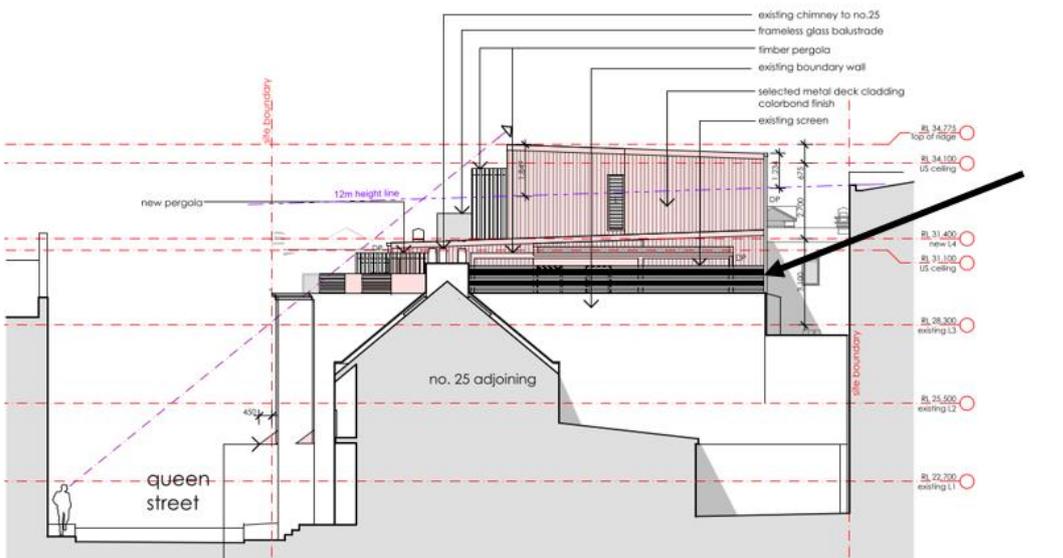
West elevation plan showing development as viewed from neighbouring dwellings to the west of the site fronting Queen Street. Existing privacy screens are being retained at the western boundary (black arrow).
